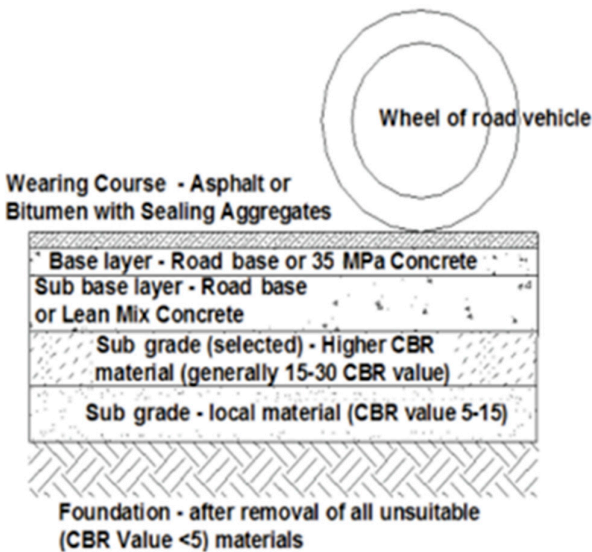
Schematic diagram of pavement layers in a typical pavement (ADAA, 2012) [21].
